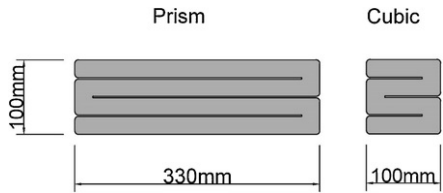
Horizontal printed path cross-section "four lines printed specimen".
